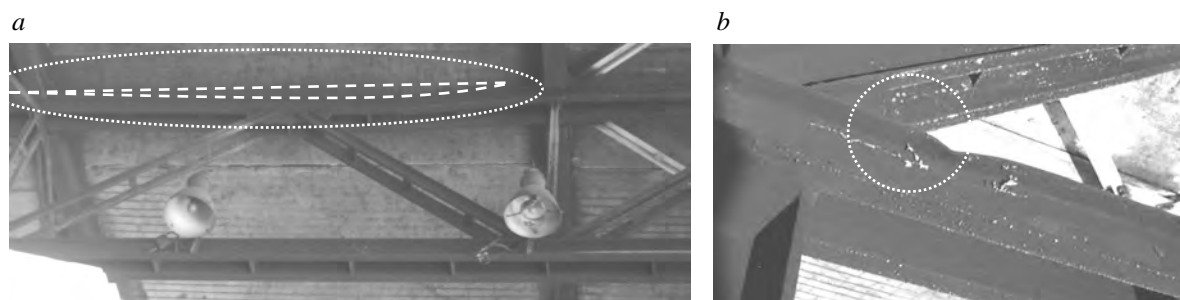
a) the deformed buckled top chord of the truss tie-beam in the 16 axis (over the outbreak of fire) b) the deformed bottom chord of the truss tie-beam in the 16 axis (over the outbreak of fire)
